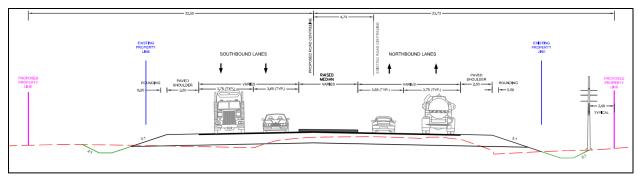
Proposed Airport Road Roundabout Approach Cross-Section (Region of Peel)
